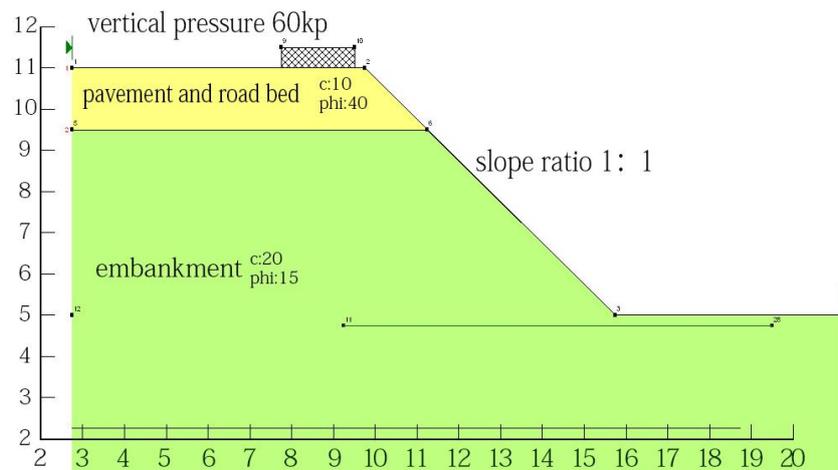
The Model Of Steep Embankment (slope ratio 1:1)
